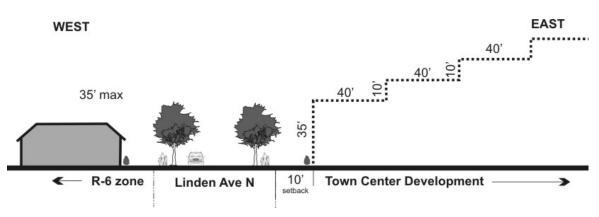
(B)(1)(a). Maximum building height envelope on the east side of Linden Avenue N.
